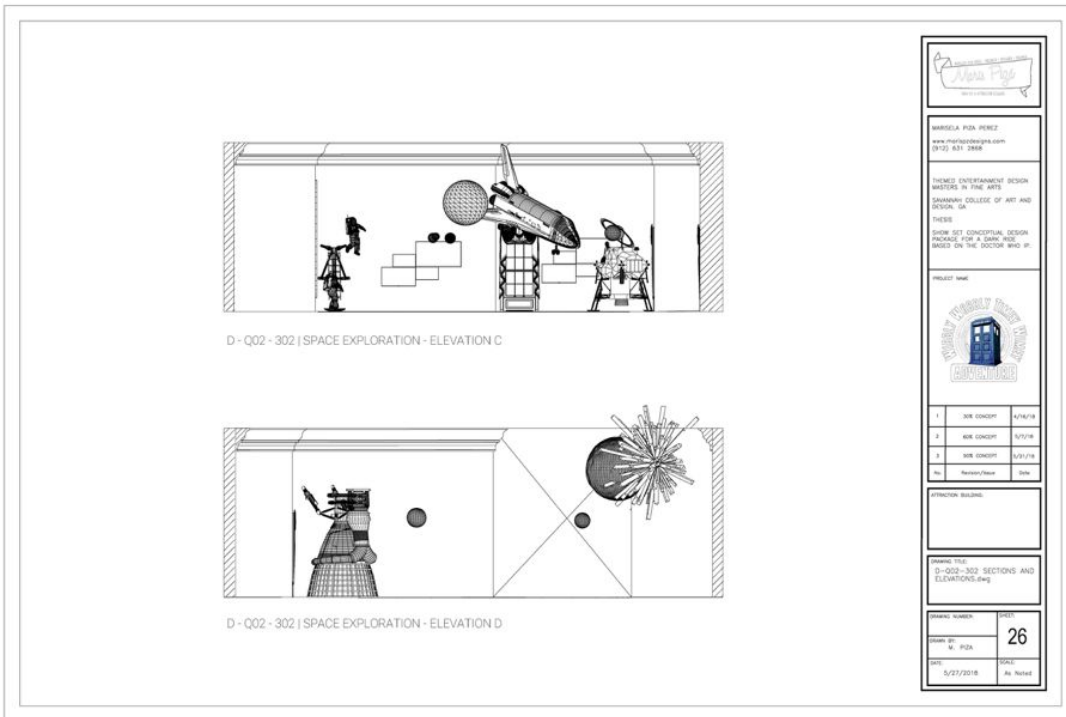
D-Q02-302 | Space Exploration - Sections and Elevation
